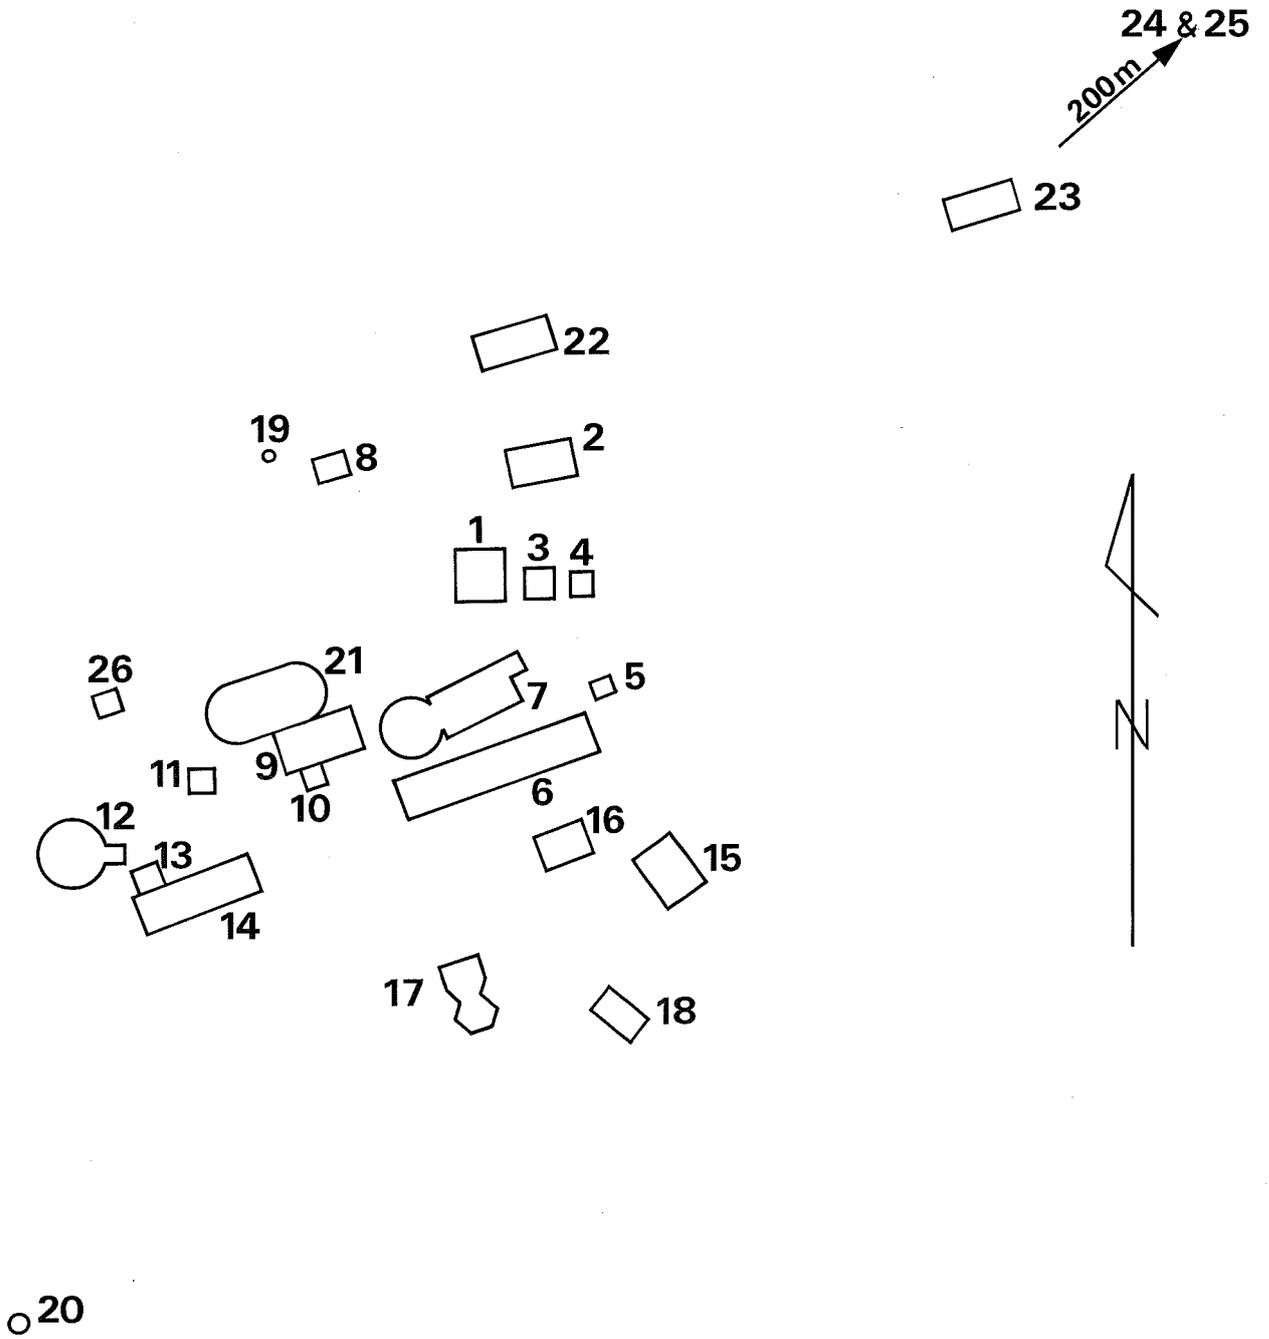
Sketch plan of buildings reported on at the ANARE Station, Heard Island (scale about 1:750)
